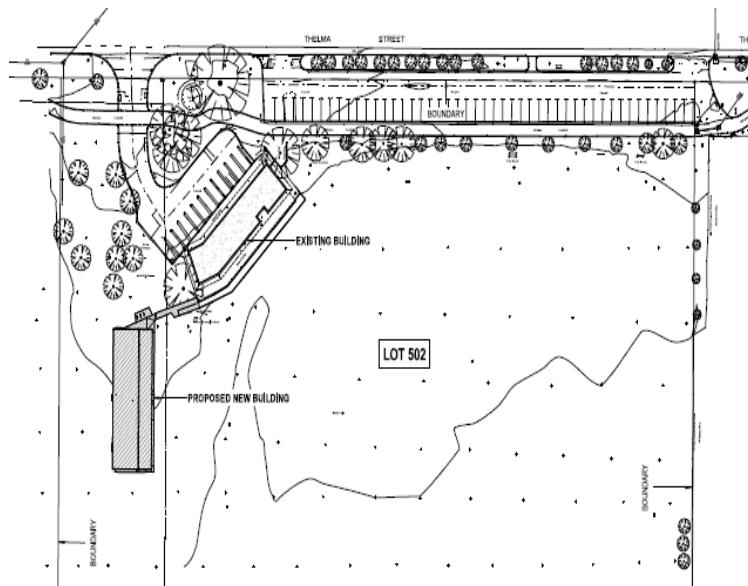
Site Plan of Collier Reserve indicating location of proposed new changeroom building in relation to existing changeroom building.
